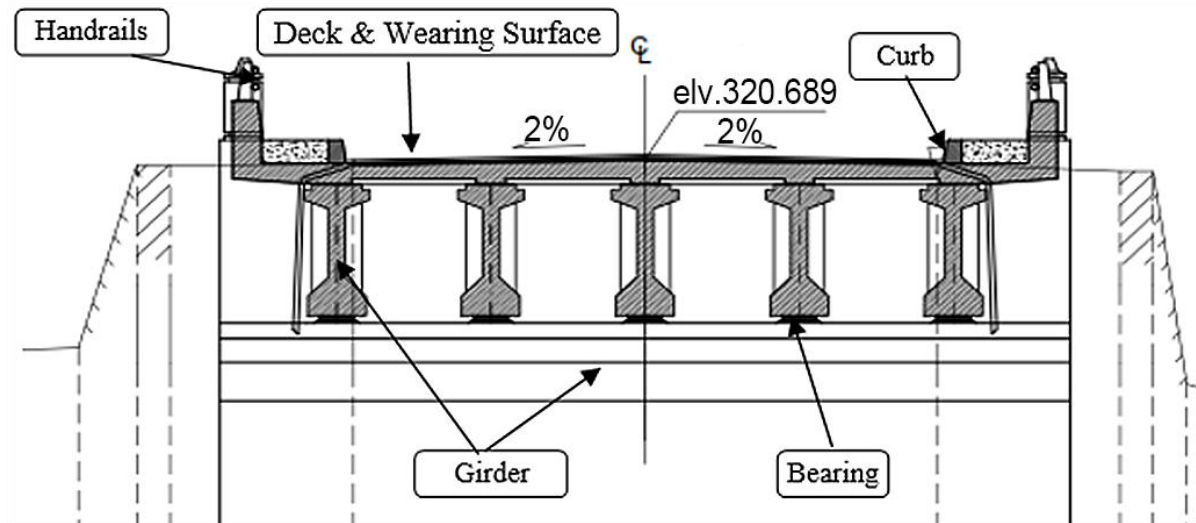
The Typical Cross Section of Concrete Bridge Structure
